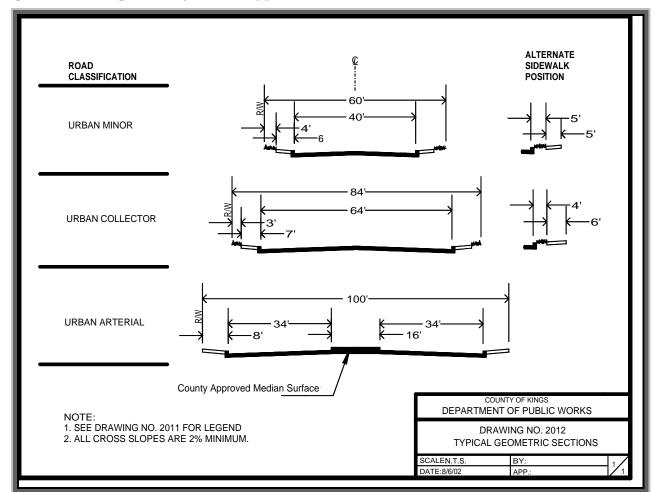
Kings County Roads Typical Cross Sections – Urban Roads
